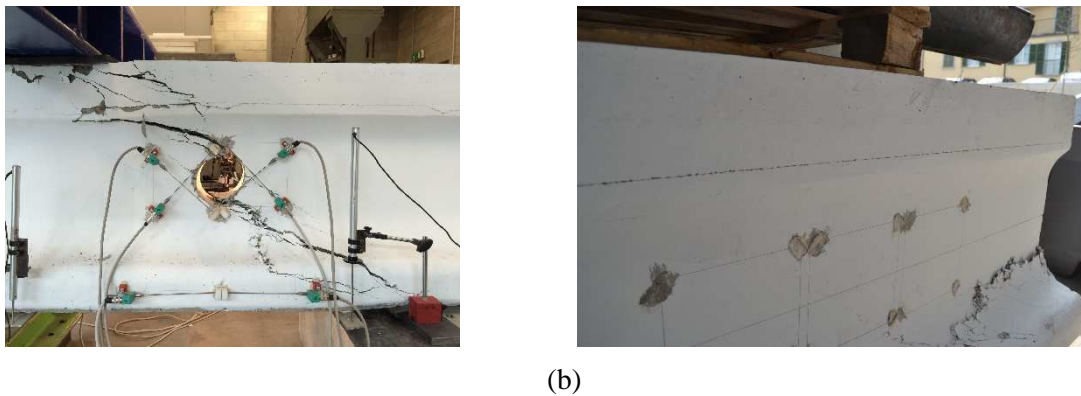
Typical failure modes and damage mechanisms for Beam 1 and Beam 2
